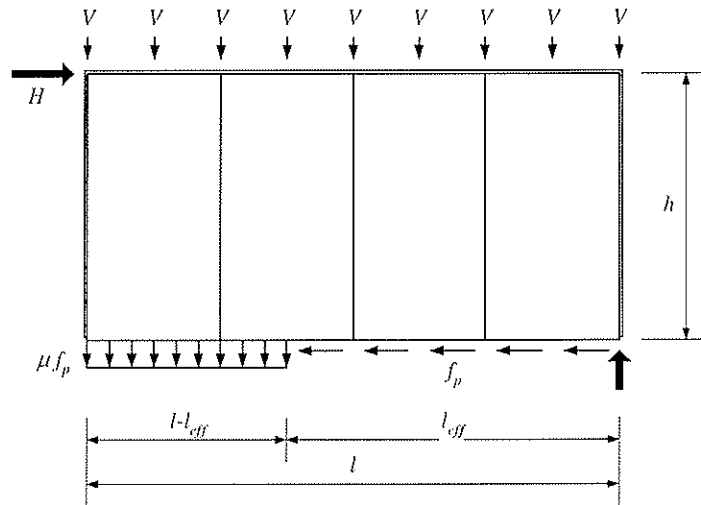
Forces acting on a shear wall in the case of a fully anchored bottom rail and vertical loads on all studs.
